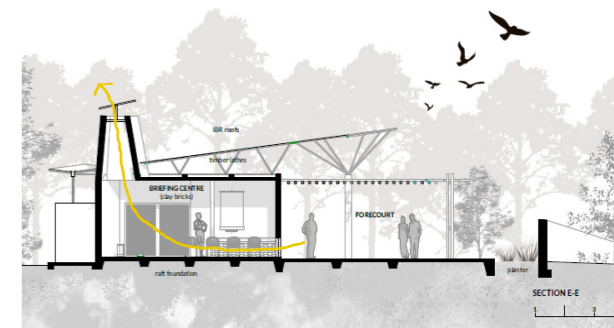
Practical air movement in the building with chimney (Author, 2021)
